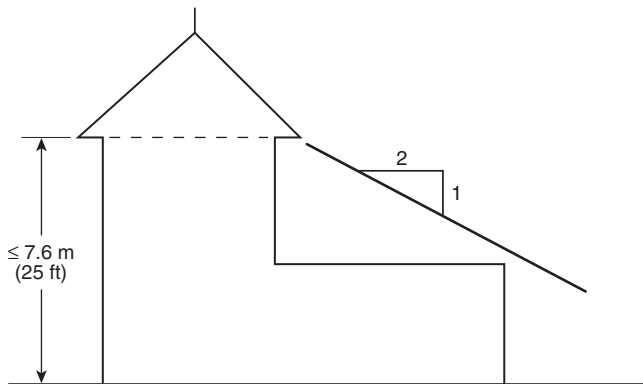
(b) Lower Roof Protection Provided by Pitched-Roof Buildings 7.6 m (25 ft) or Less in Height.
